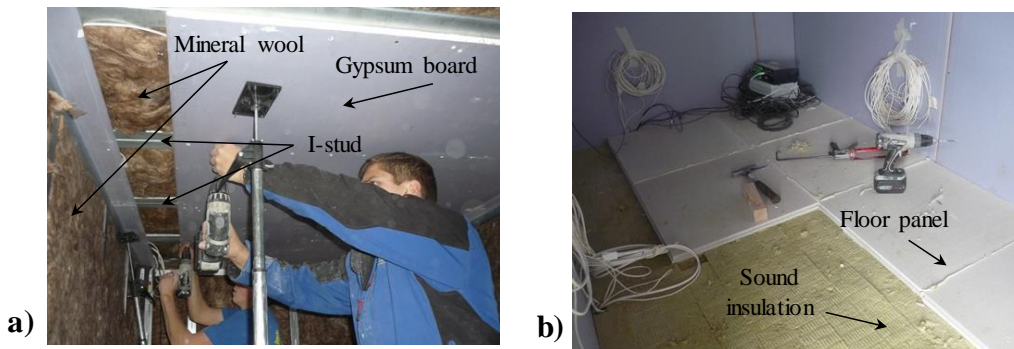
Installation of materials: a) at the roof and b) at the floor.
